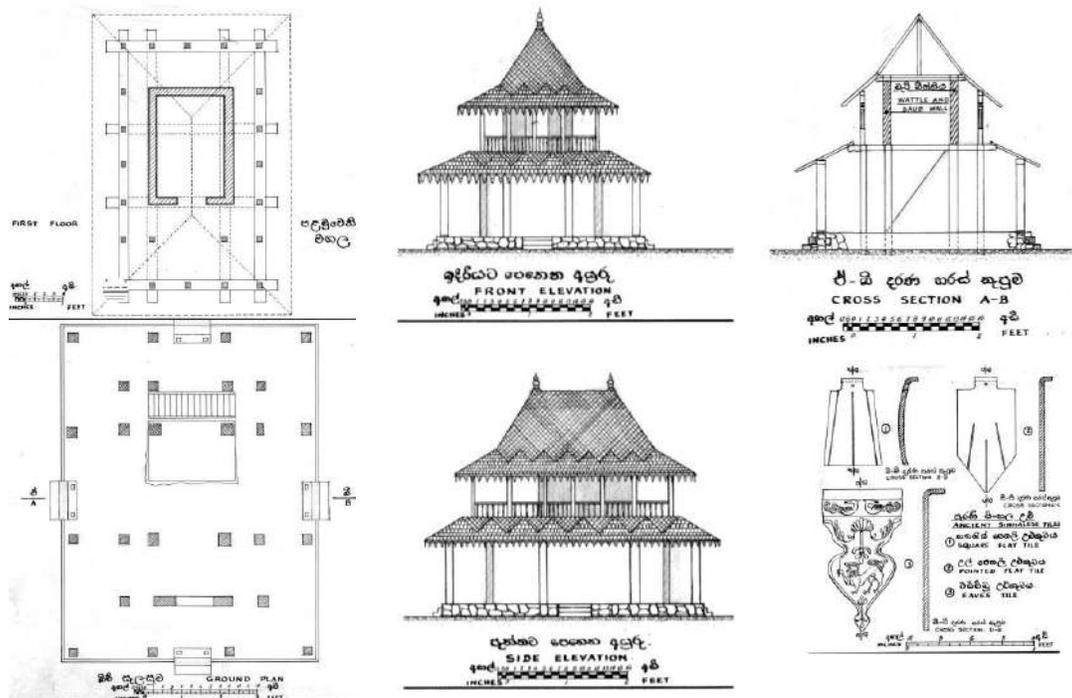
,2,3,4,5,6 Plans, Elevations, Sections and tile Details of Ambulugala Danthapaya Tampita Vihara (Source: Conservation report, Department of Archaeology, Sri Lanka. 2024)
